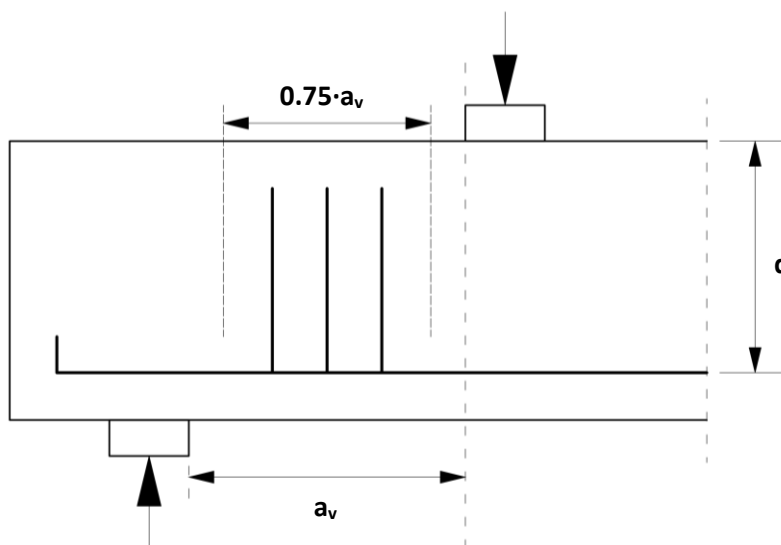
Beam with load near direct support. Adapted from EC2 Section 6.2 'Shear'.
